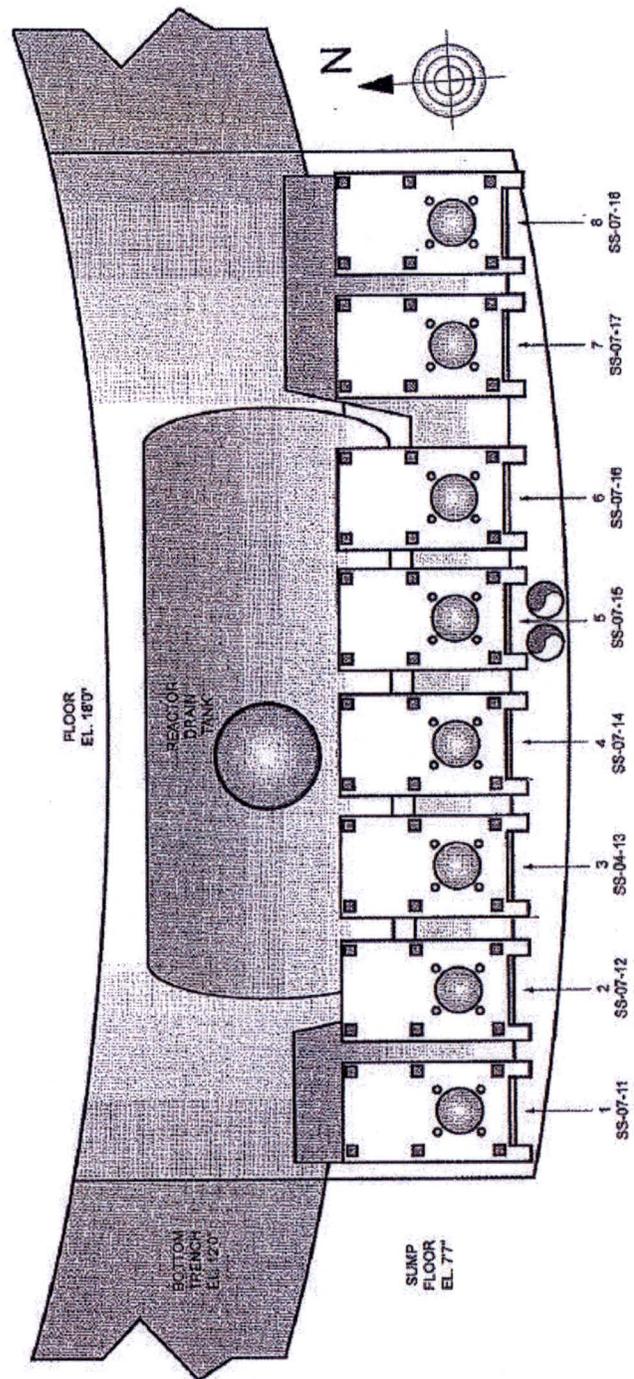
j.1-7: PSL2 Containment Recirculation Sump Strainers – Top View [JT473]
